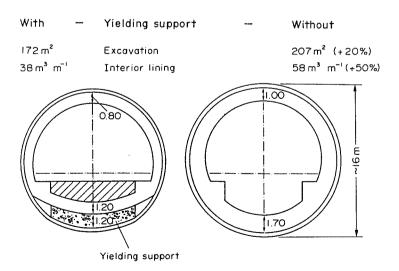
Freudenstein Tunnel: tunnel sections with and without yielding support in the Gipskeuper rock formation with high swelling potential (swelling strain > 20%, swelling pressure > 6 N mm<sup>-2</sup>)
